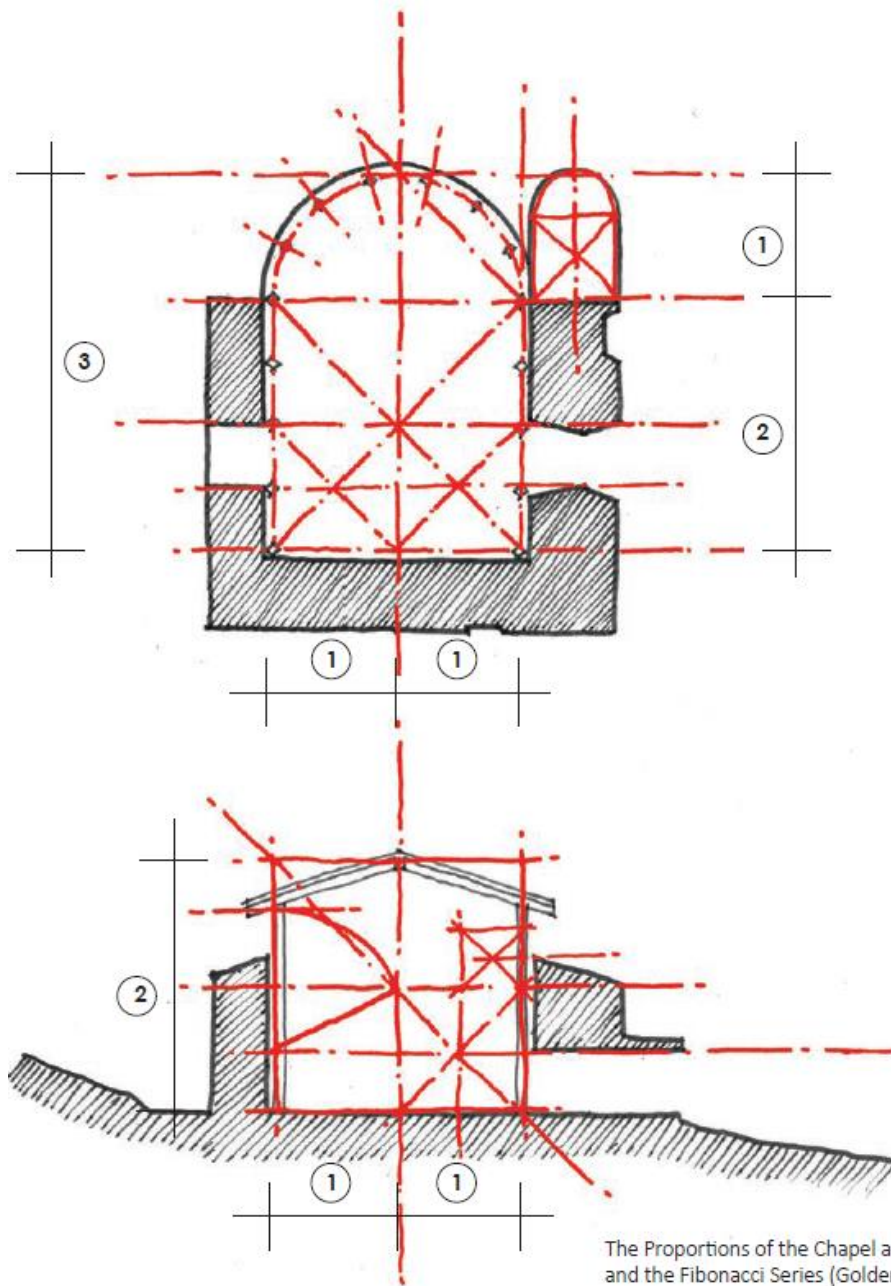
The proposed Chapel's height and geometry is in proportion to its floor plan (accommodation capacity) based on the 'Fibonacci Series (Golden Ratio)' (source: Architectural Design Statement)
